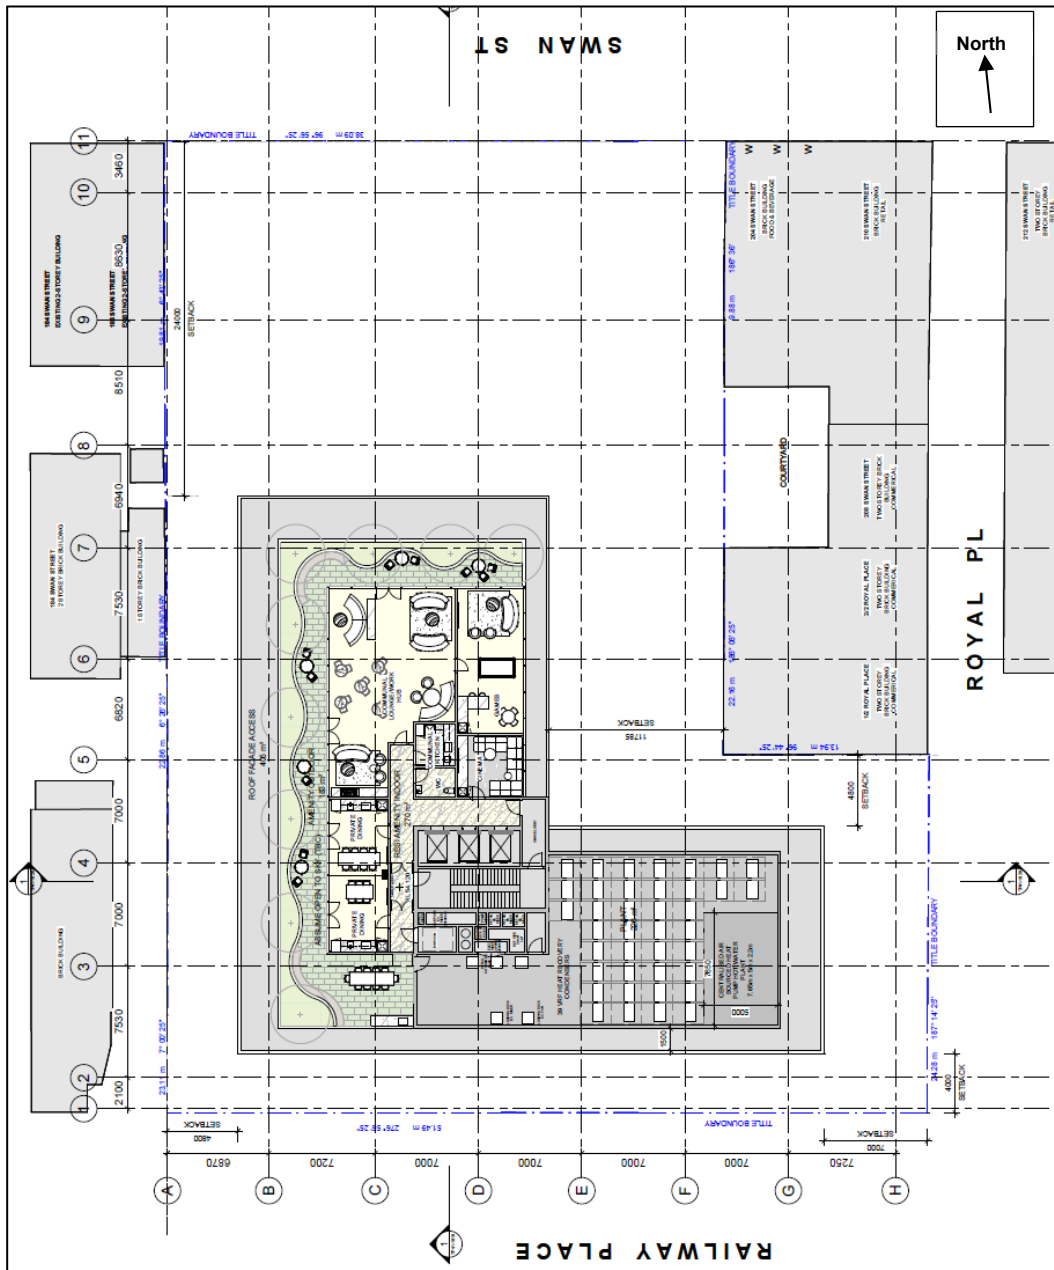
Roof level floor plan of the proposed 188-202 Swan Street Development.
